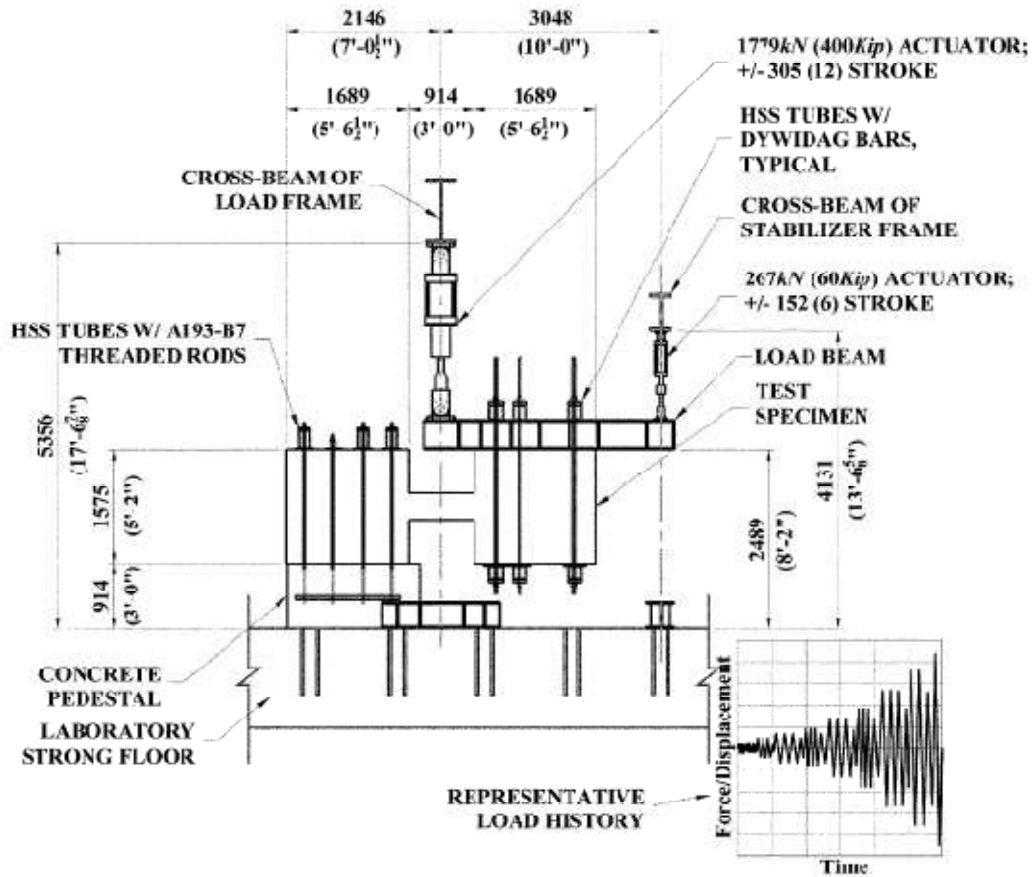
Testing Setup of Coupling Beam Specimen (Fortney et al., 2008)
